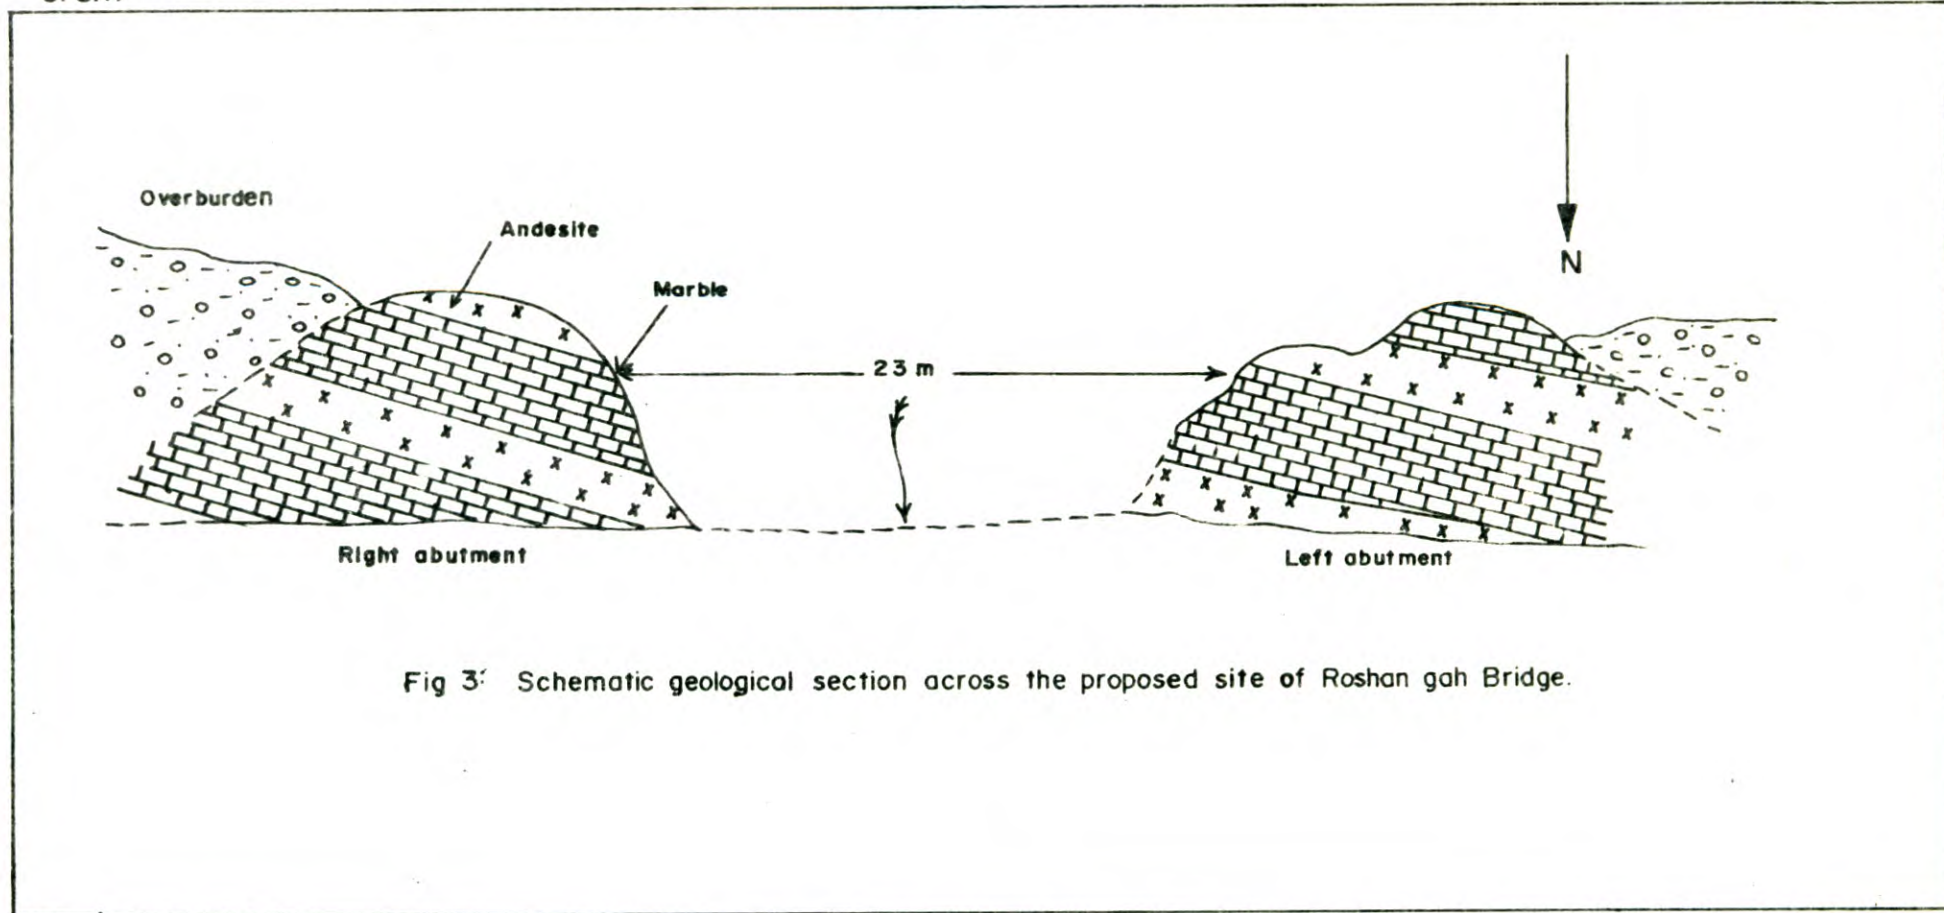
Schematic geological section across the proposed site of Roshan gah Bridge.
